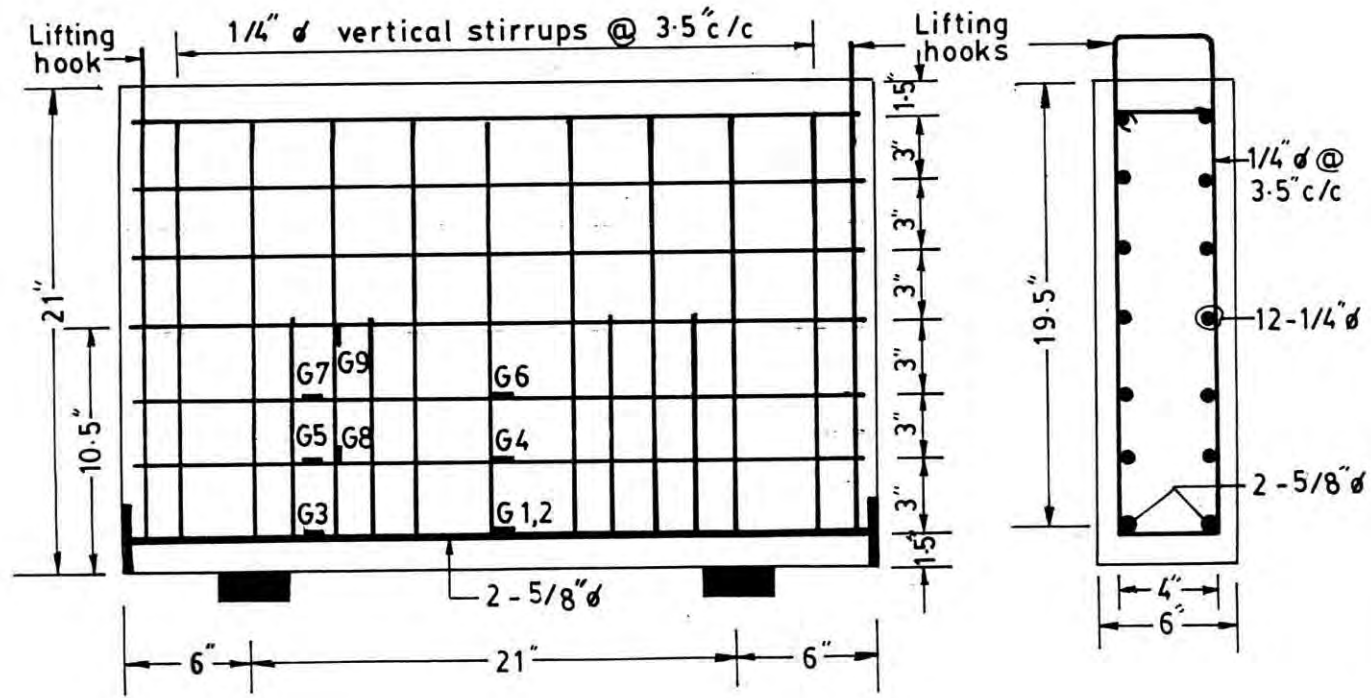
Reinforcement arrangement of Beam DB-P4
